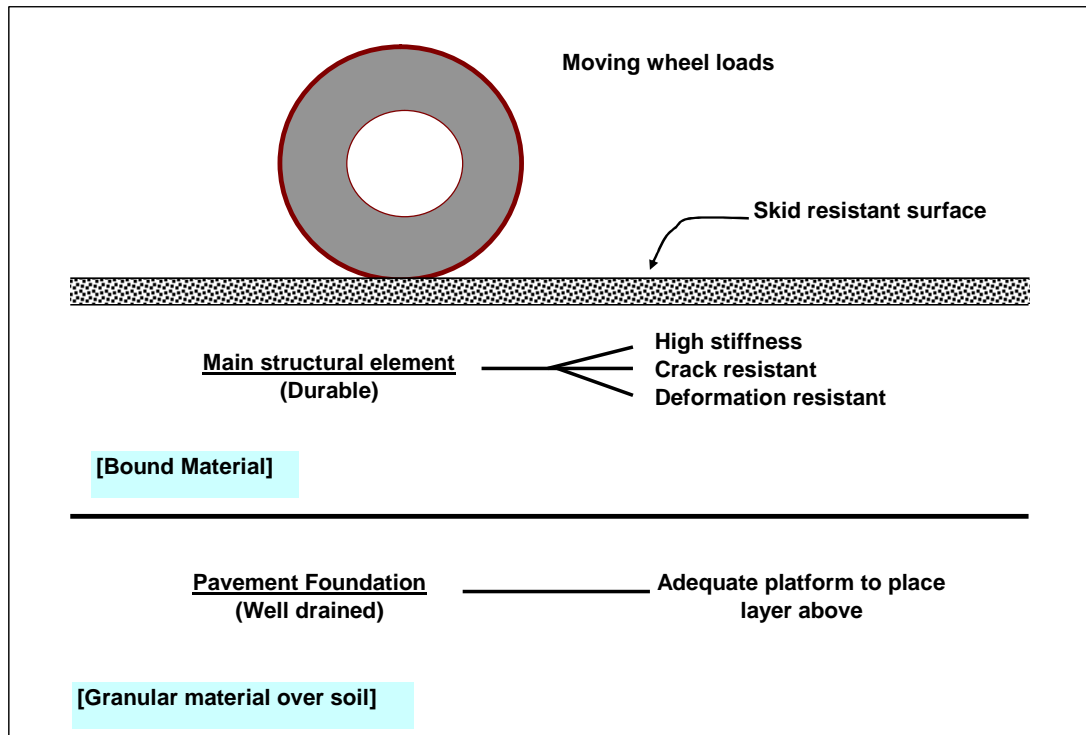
The 'ideal' pavement (after Brown, 2000)
